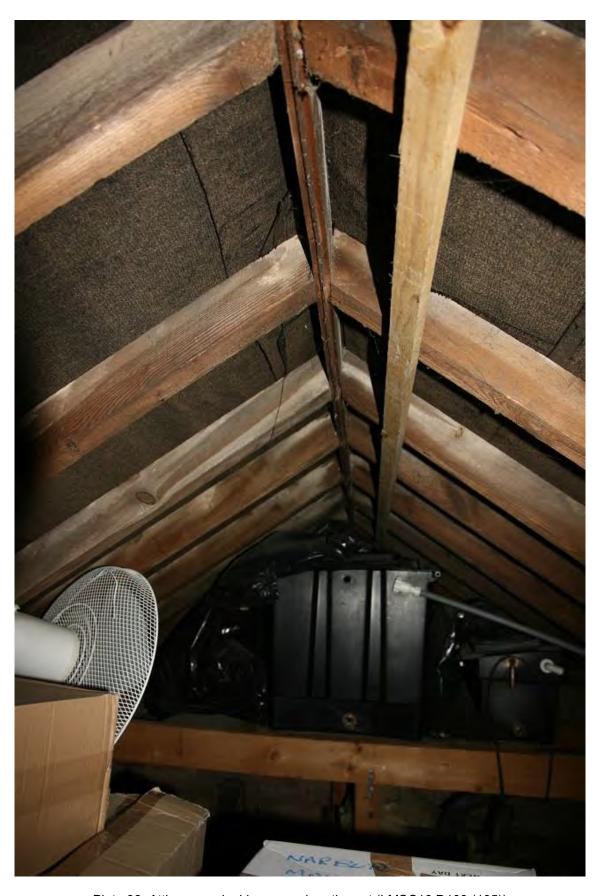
Attic space, looking up and north-east (LMSC16 D100 (105))
